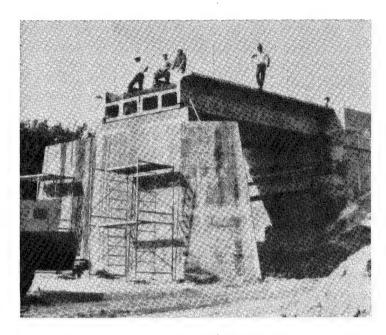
Precast 30-ft box girder approach span on precast bolster blocks, Southern Pacific Railroad (from Marianos 1991)
